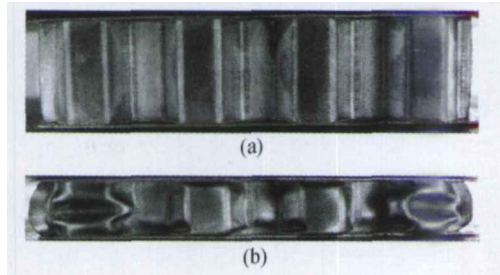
Lateral view photographs of the specimen T2 before and after testing: (a) undeformed shape before testing; (b) deformed shape after testing.
